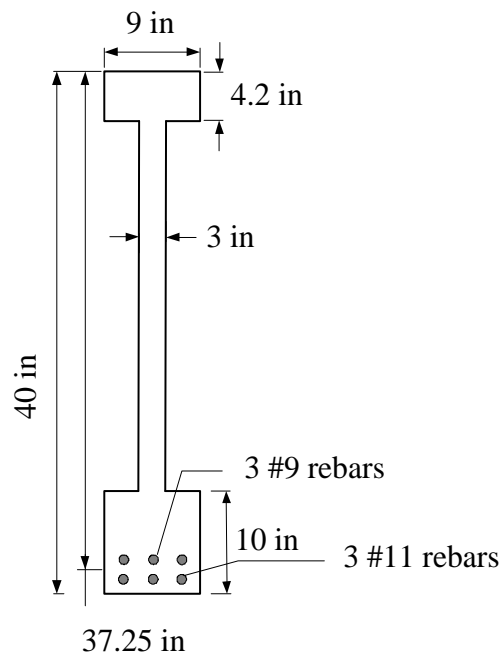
Section dimension and arrangement of longitudinal reinforcement steel rebars for section UHP/St60 40I-2
